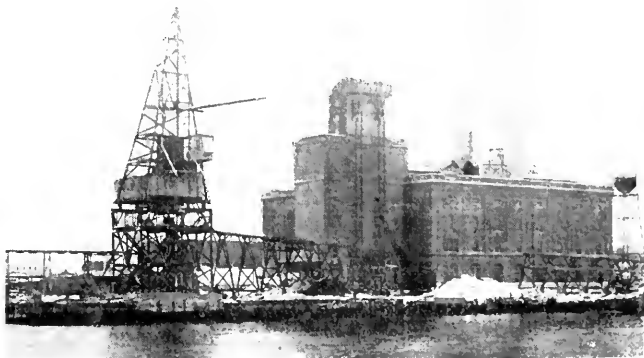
OUTDOOR COAL-HANDLING FACILITIES
